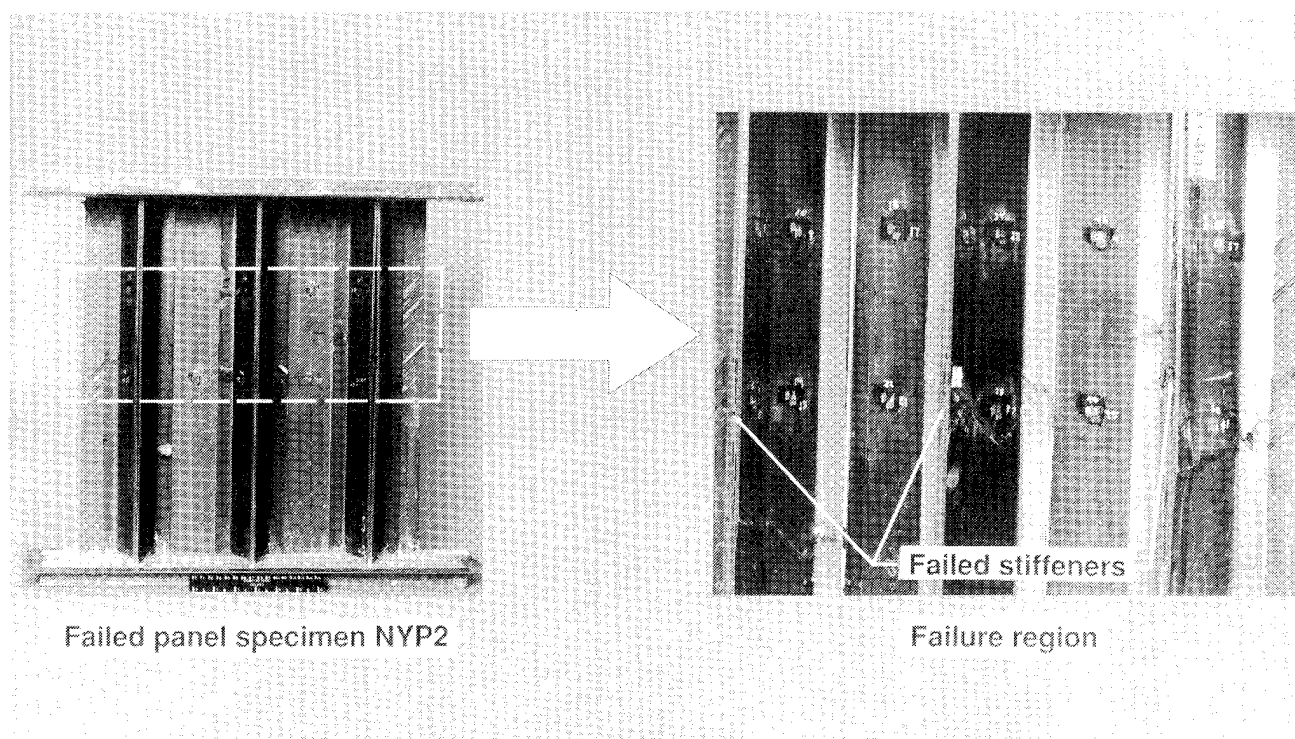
Failure mode of Y-stiffened panel specimen NYP2.
